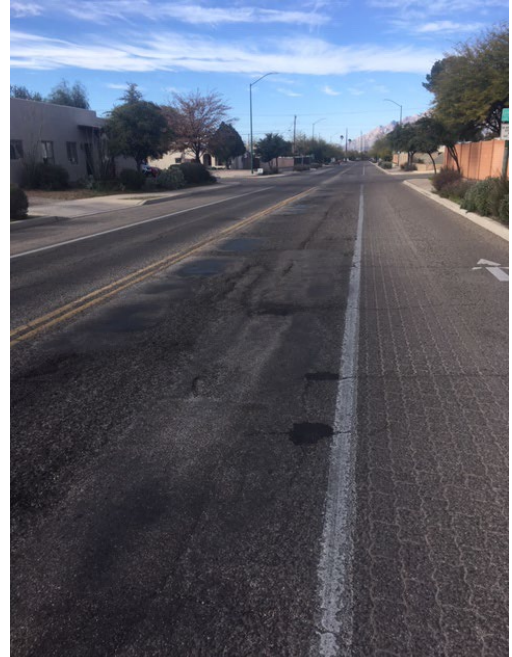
An example of the rough pavement and faded brick pavers north of Grant.
